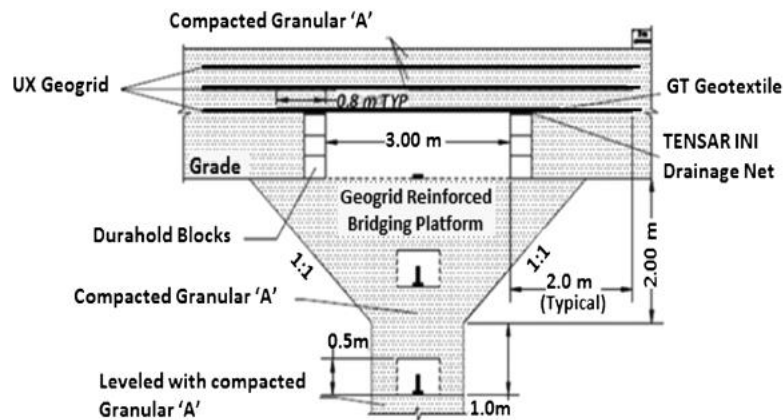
Geogrid reinforced platform bridge section (El Naggar et al. 2015).
